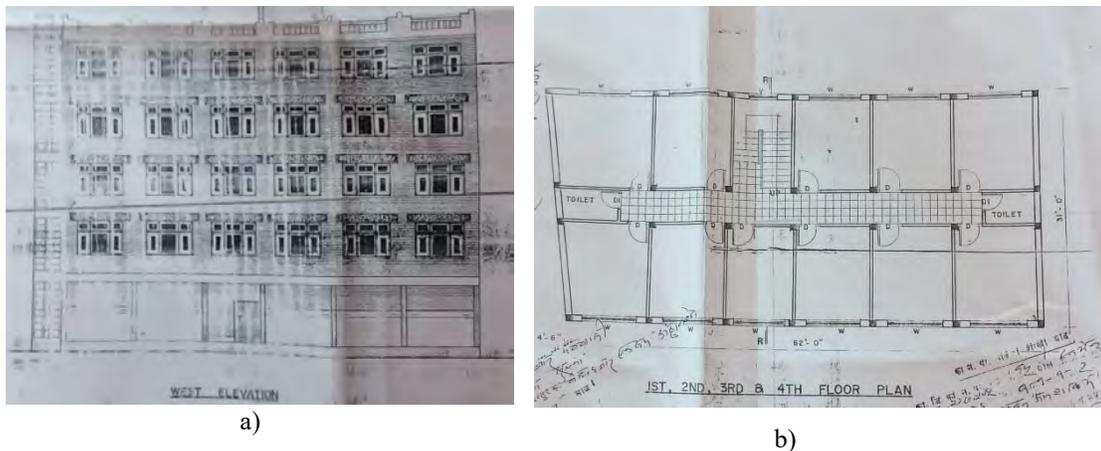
Drawings of the collapsed building in Sitapaila, Kathmandu: a) a vertical elevation, and b) a typical floor plan
